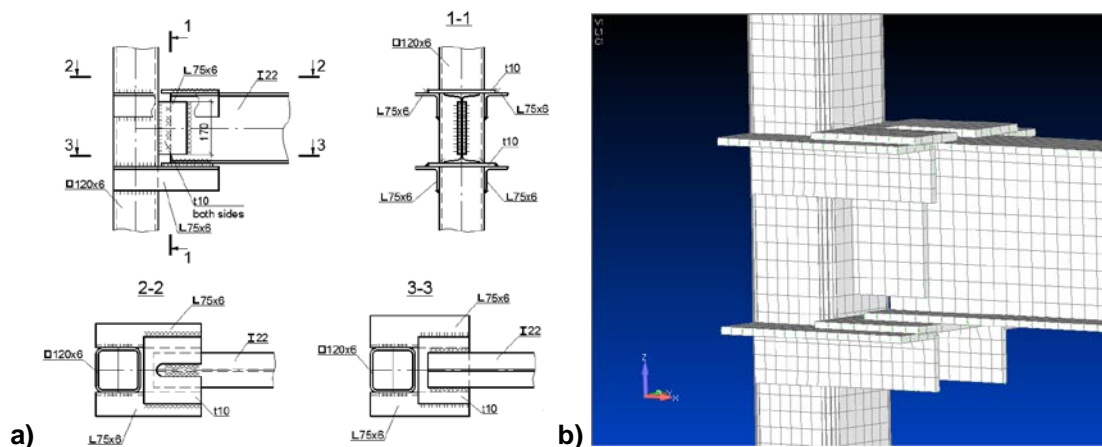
Rigid joint (2 type): a – constructive solution; b – finite-element model
